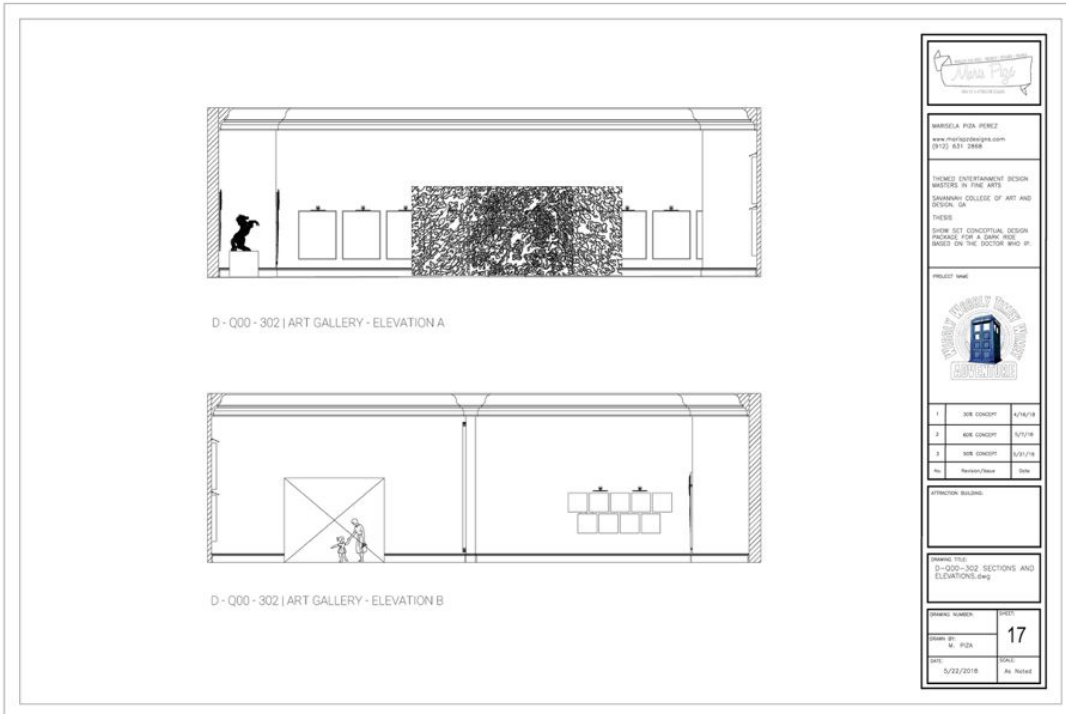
D-Q00-302 | Art Gallery - Sections and Elevations
